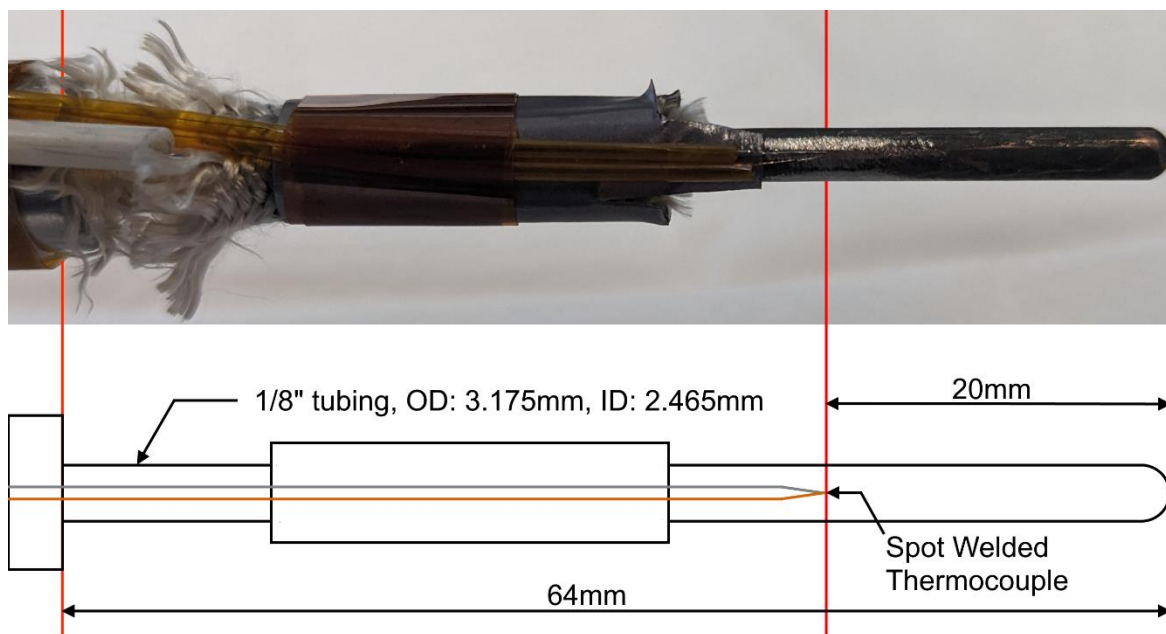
Photograph and schematic of the 50µm nozzle and spot-welded thermocouple. The stainless steel of the nozzle appears black due to oxidation which occurred during annealing of the part to any remnant magnetism. OD and ID represent outer and inner diameter respectively.
